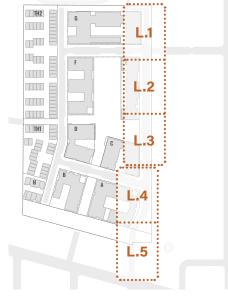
Lee Avenue, Section 1 *see "Figure 5.13–2: Lee Avenue, Plan Enlargements L.1
